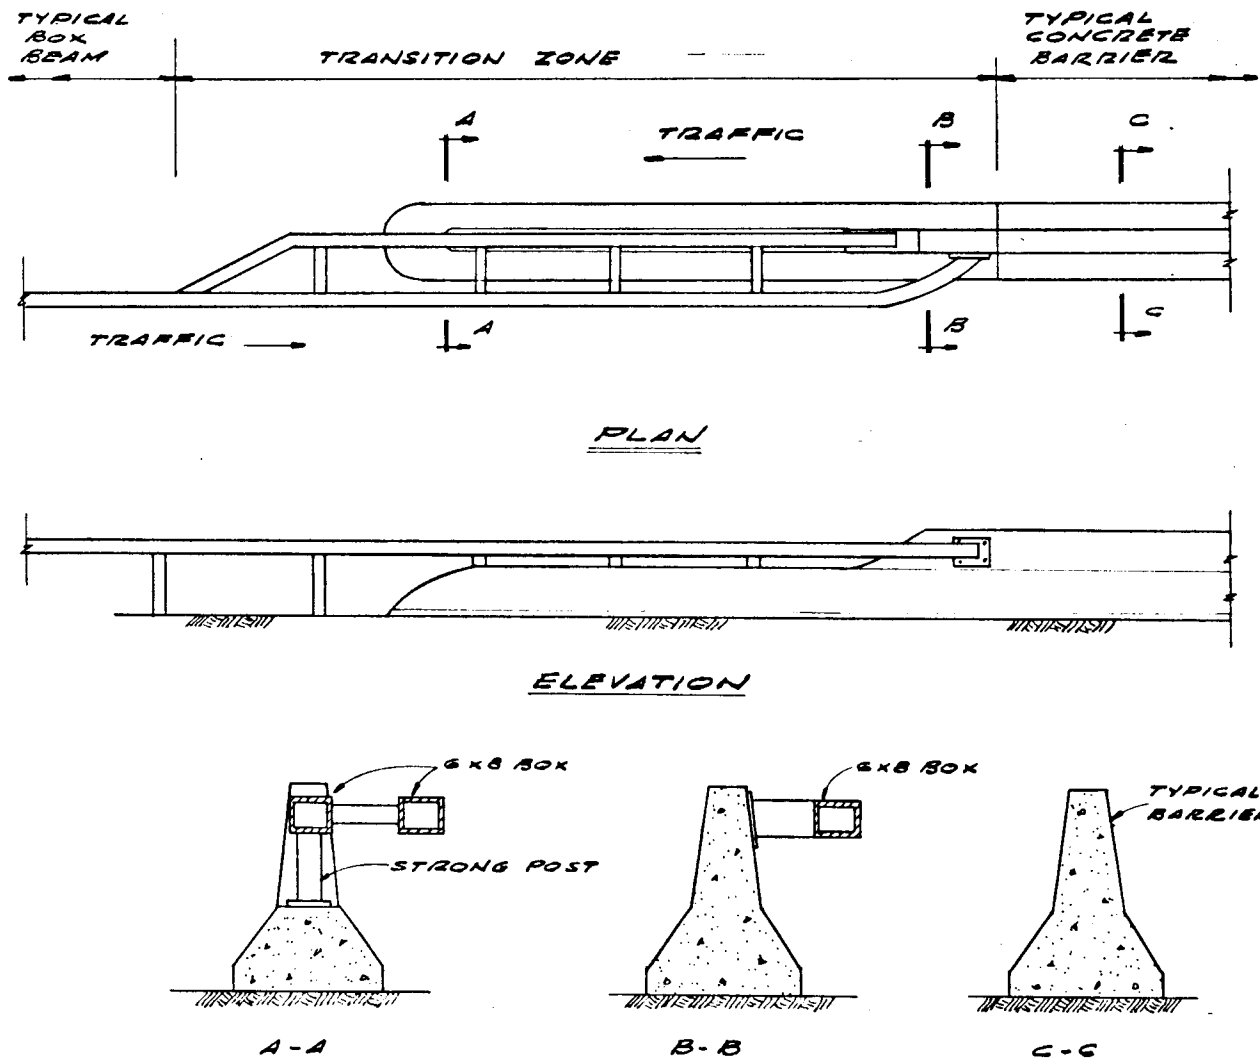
BOX BEAM TO CONCRETE BARRIER TRANSITION (CONCEPT A)
